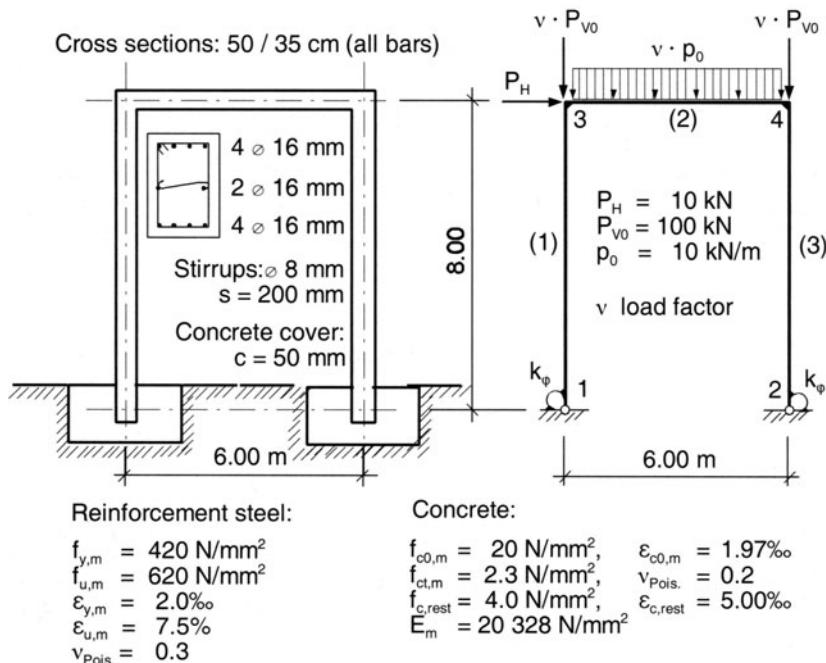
Reinforced-concrete frame (plane); structure and statical system with loading
